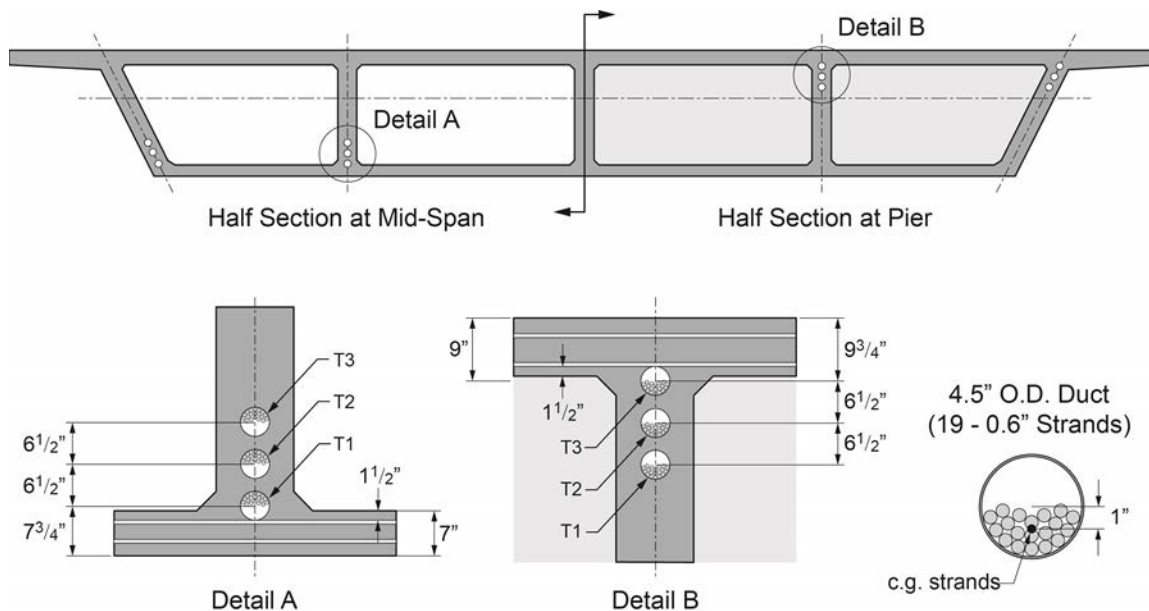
Cross Section of Superstructure for Design Example 1
